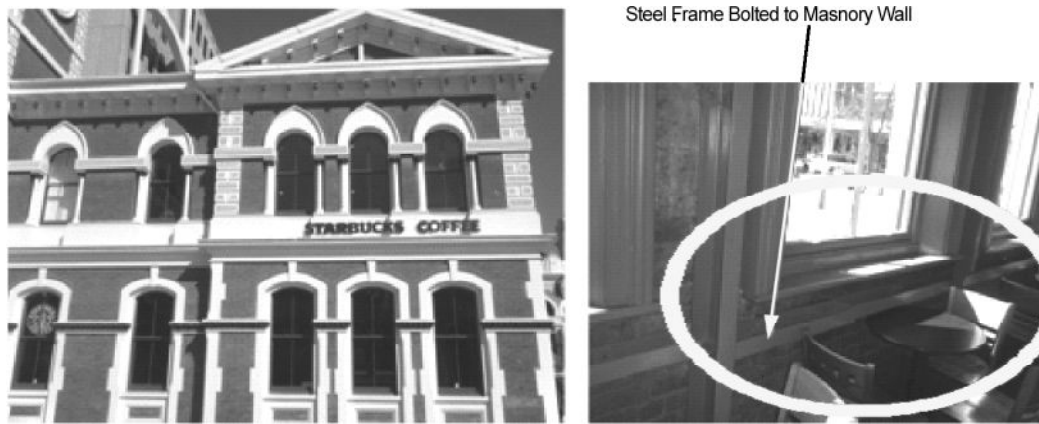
URM building at Cathedral Square retrofitted by steel frame bolted to the masonry wall.
